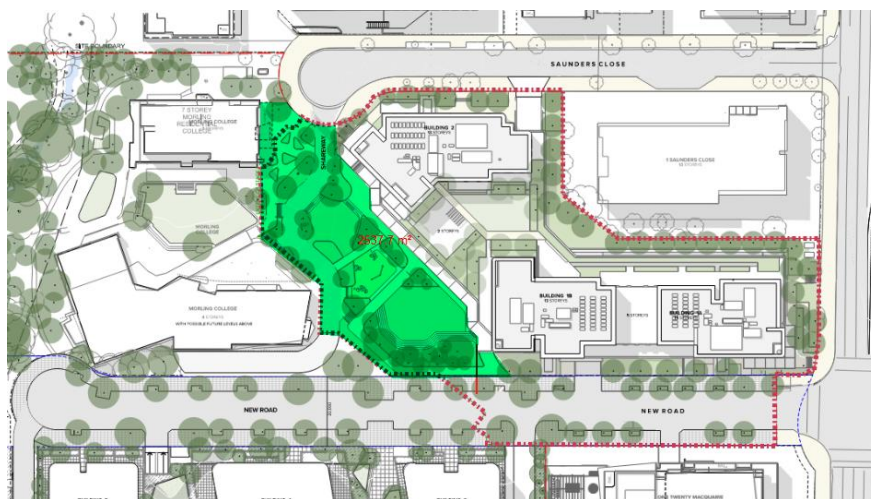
Provision of open space under the amended masterplan and Site A detailed design.
